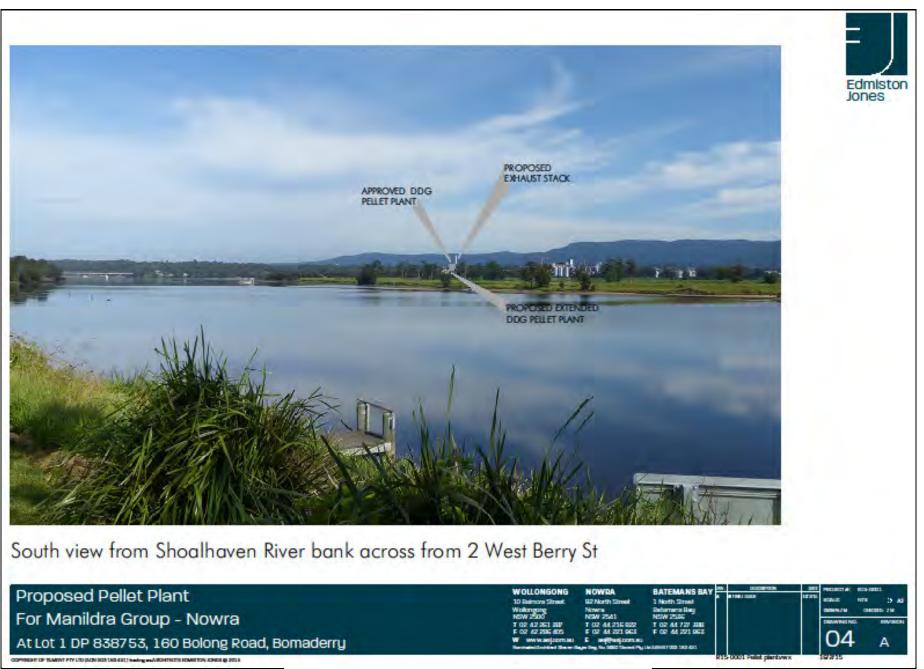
View of Shoalhaven Starches factory site from village of Terara.
